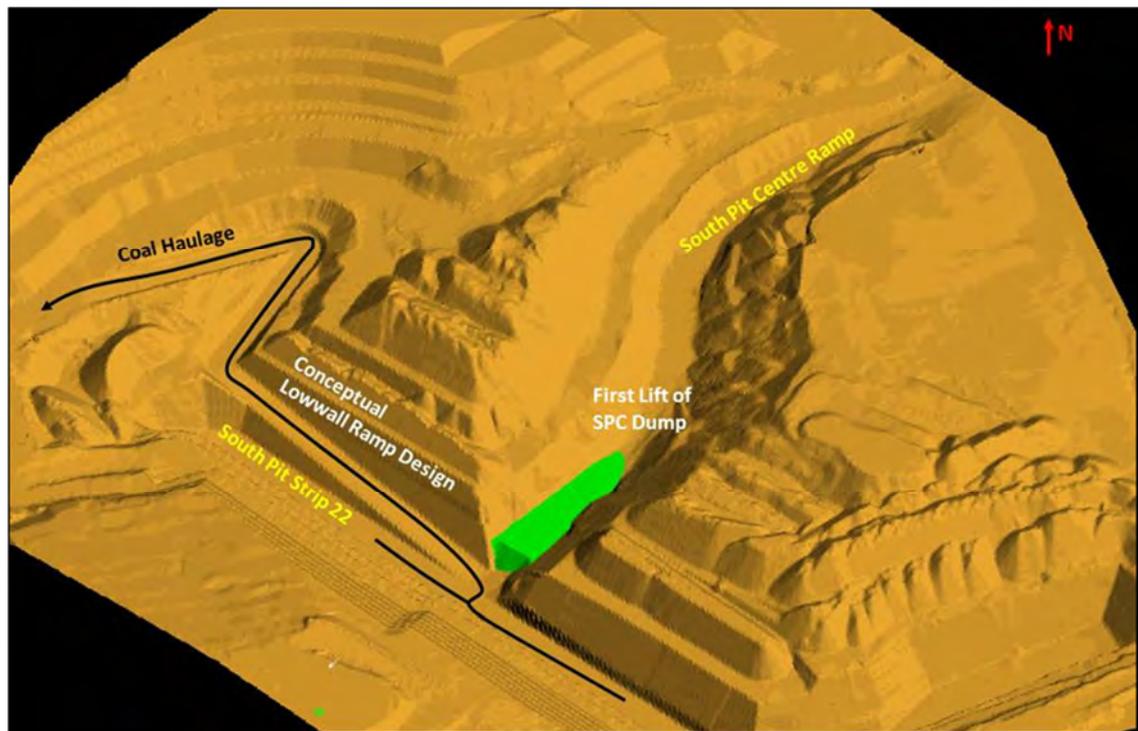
Strip 22 conceptual lowwall ramp design.
